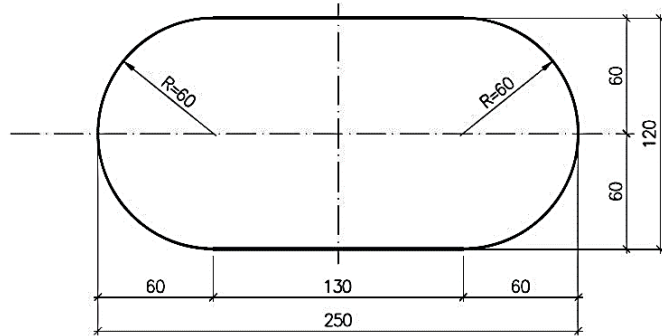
Cross Section of the Piers of Panayır Bridge (in cm)
